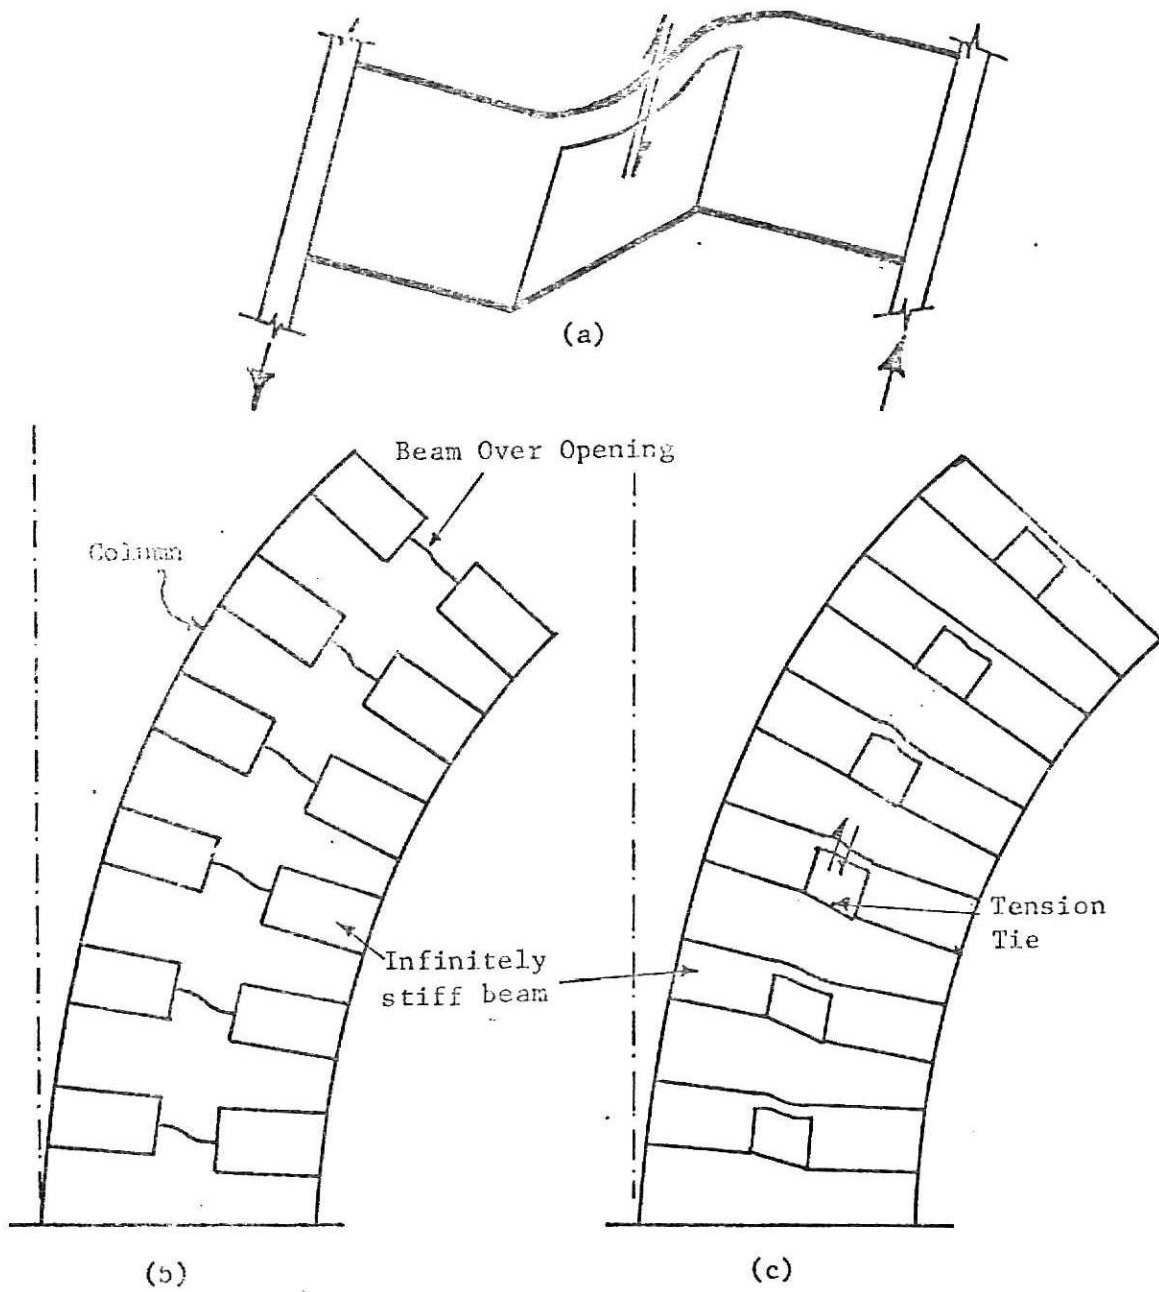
Action of Wall-Beams with Openings Subjected to Lateral Loads
